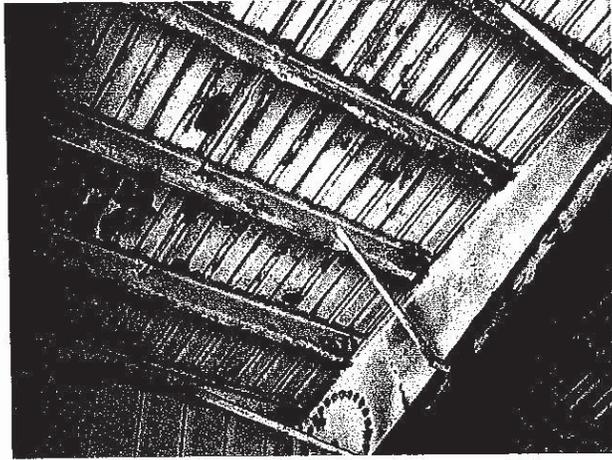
Tahoe City site – peeling interior paints (sand storage)
